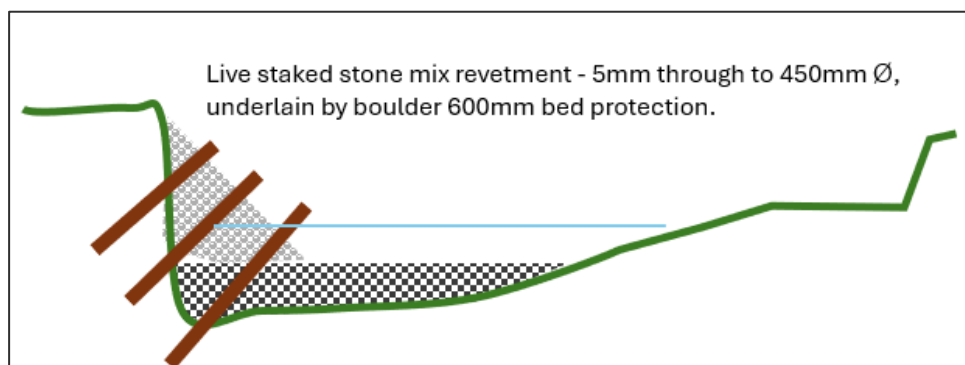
Detailed design drawing outlining the restoration works for Site 15.
